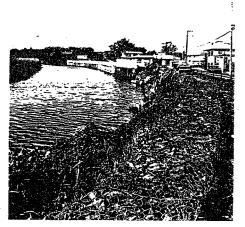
Gabion reinforcement of river bank along Road 684 north of the town of Barceloneta.
